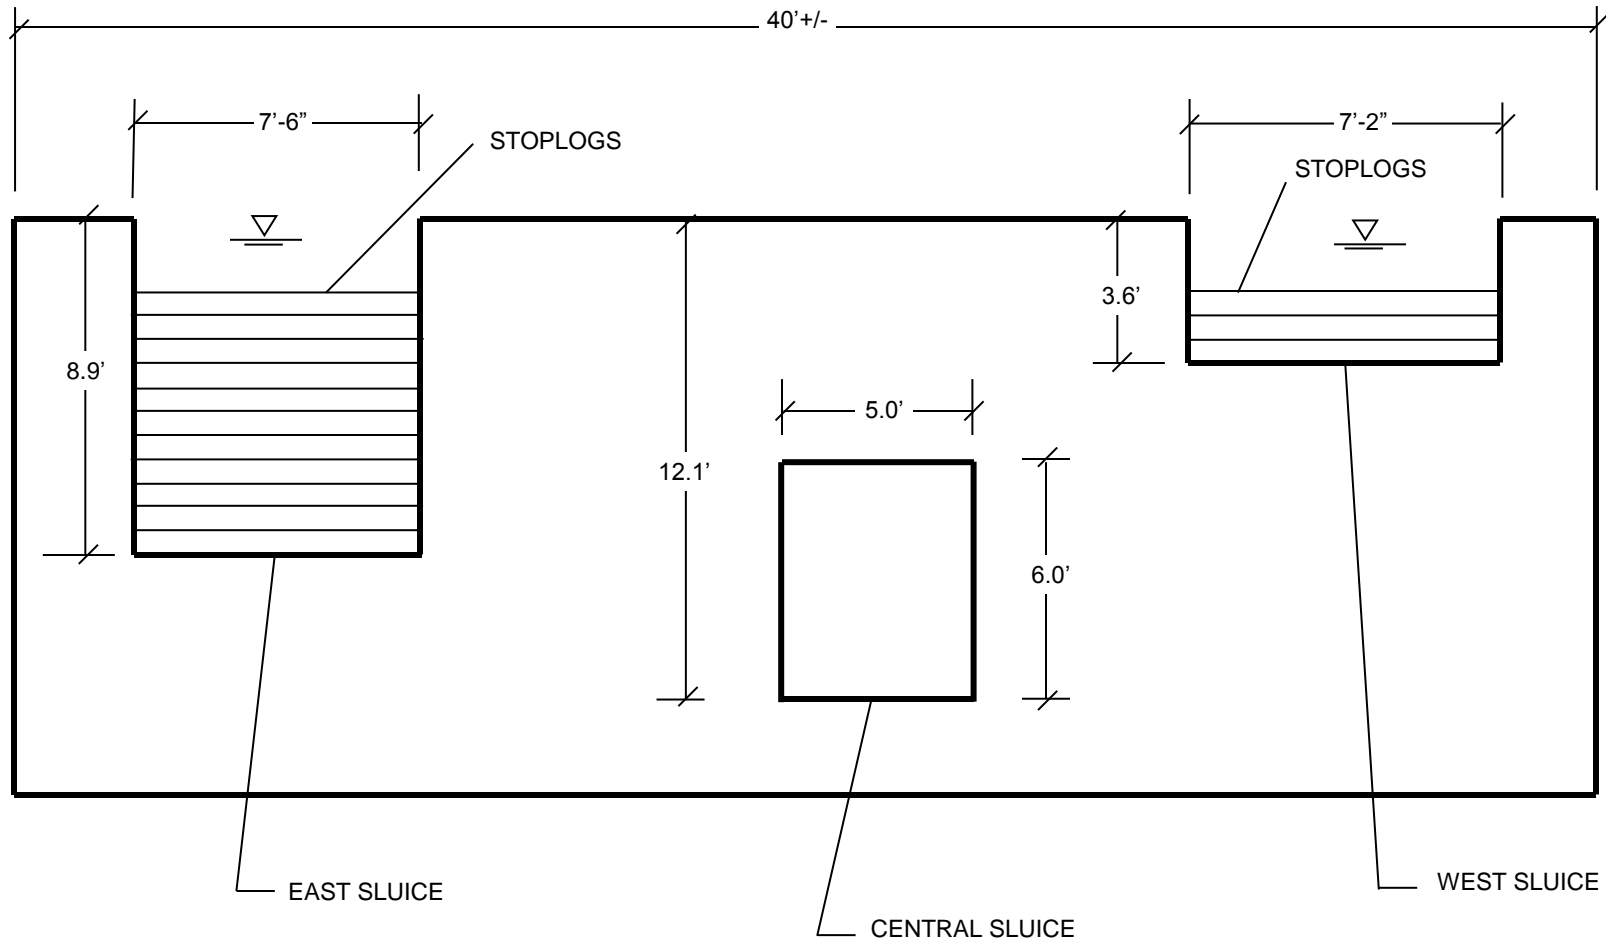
DOWNSTREAM ELEVATION OF MASONRY DAM SECTION: GENERAL ARRANGEMENT.
